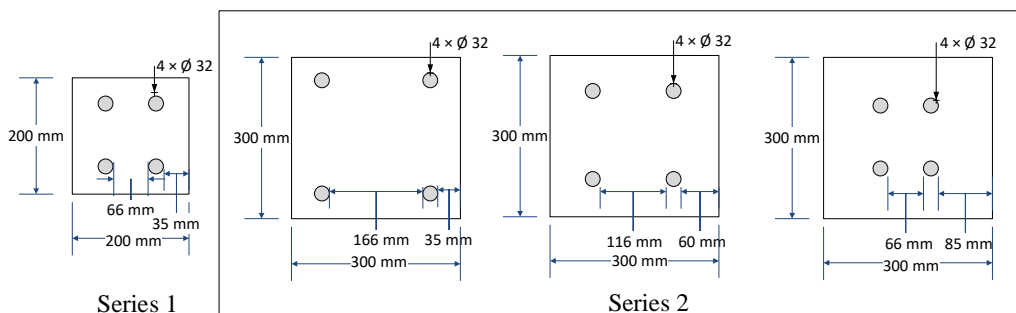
Cross-section details of the tested RC specimens (all specimens are 2 m in length).
